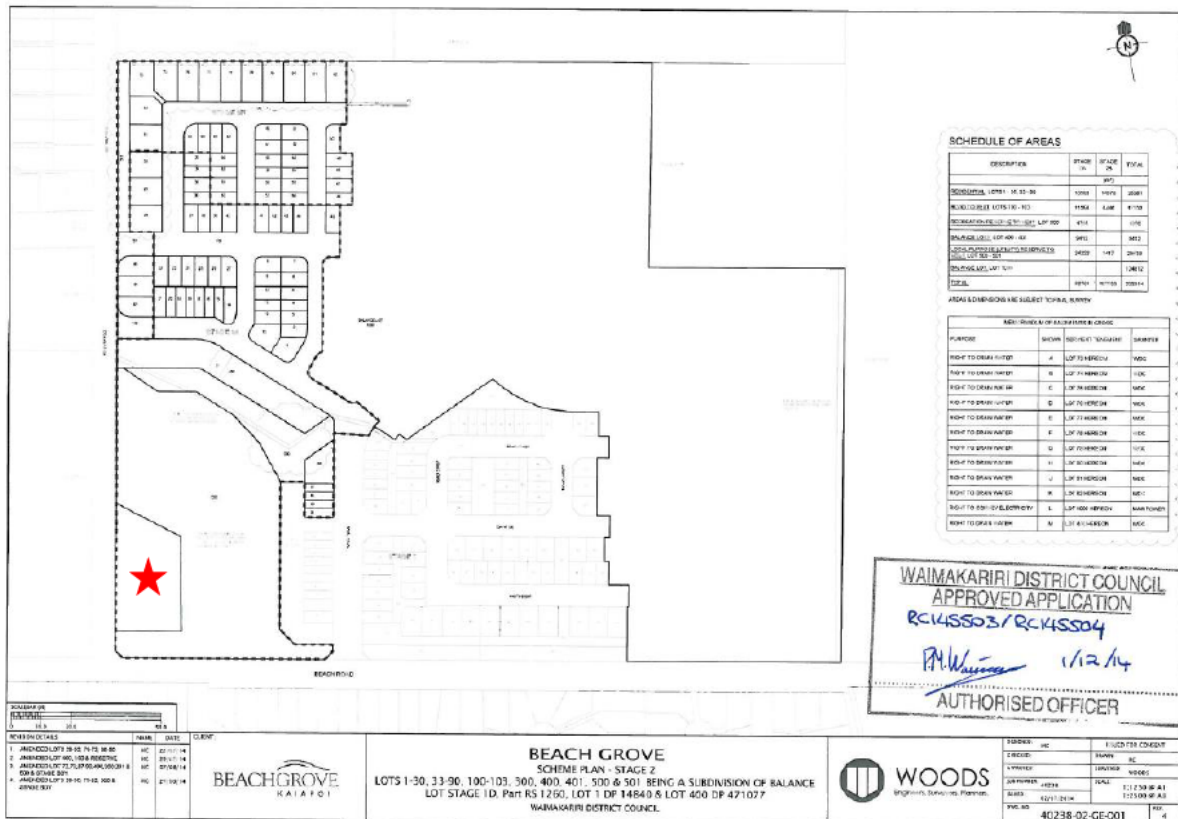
Approved subdivision plan (RC145503, December 2014) showing Lot 401 (red star) – subsequently further subdivided to create 302 Beach Road (Lot 112 DP 498086) and 306 Beach Road (Lot 113 DP 498086)
